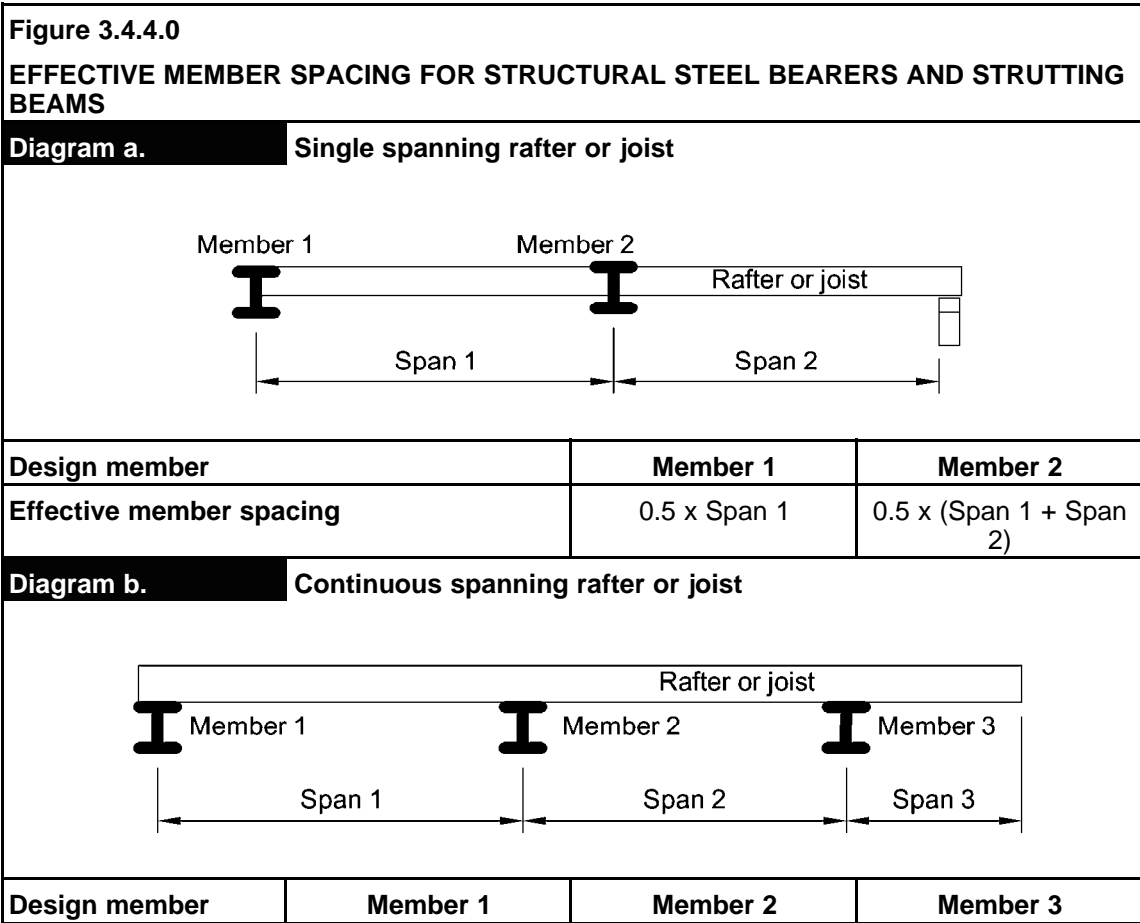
EFFECTIVE MEMBER SPACING FOR STRUCTURAL STEEL BEARERS AND STRUTTING BEAMS
